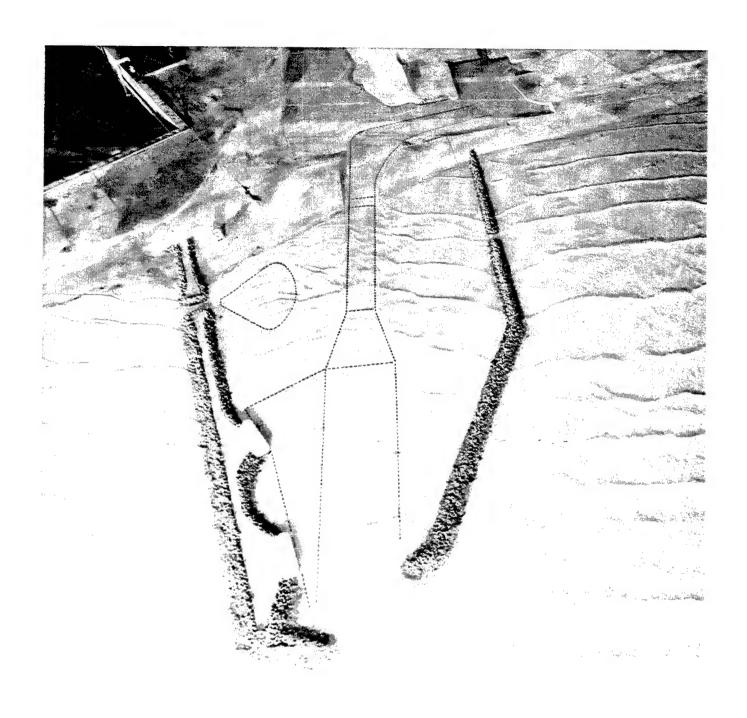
Typical wave patterns for Plan 19; 12-sec, 5-m ((16.4-ft) waves from 227 deg; swl = +0.5-m (+1.6-ft)
